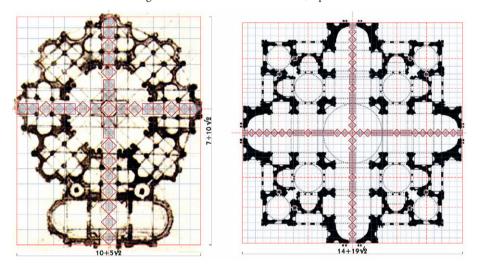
The Study of a Central Church by Leonardo da Vinci and Bramante's floor plans for St. Peter's in Rome
